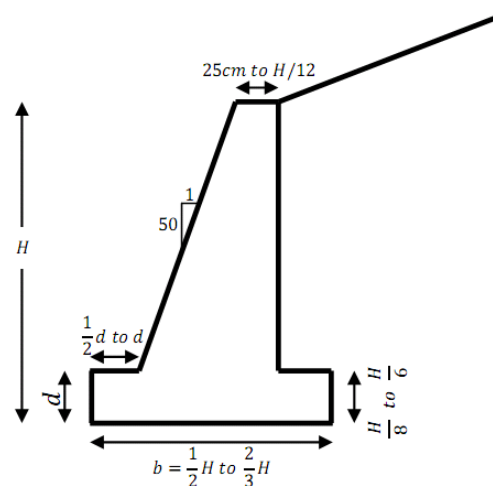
Tentative dimensions for gravity retaining wall [1][10]
